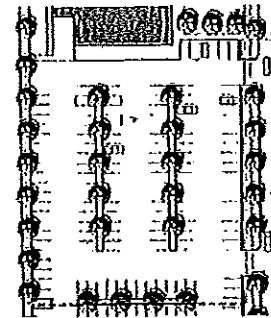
Area of parking lot south of proposed grocery store, showing tree planting strips.
